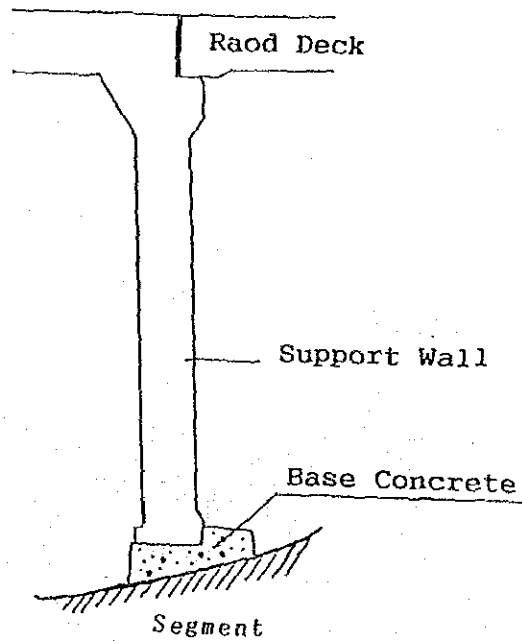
Base Concrete at The Foot of Support Wall
